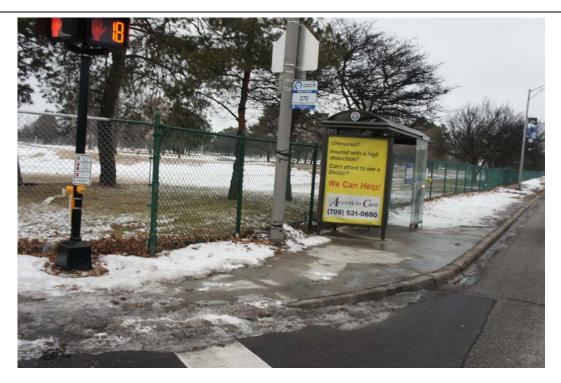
View of the proposed location for the northbound Main Street Station, looking northwest. The fence surrounding the closed Marathon gas station is visible on the right side of this photo.
